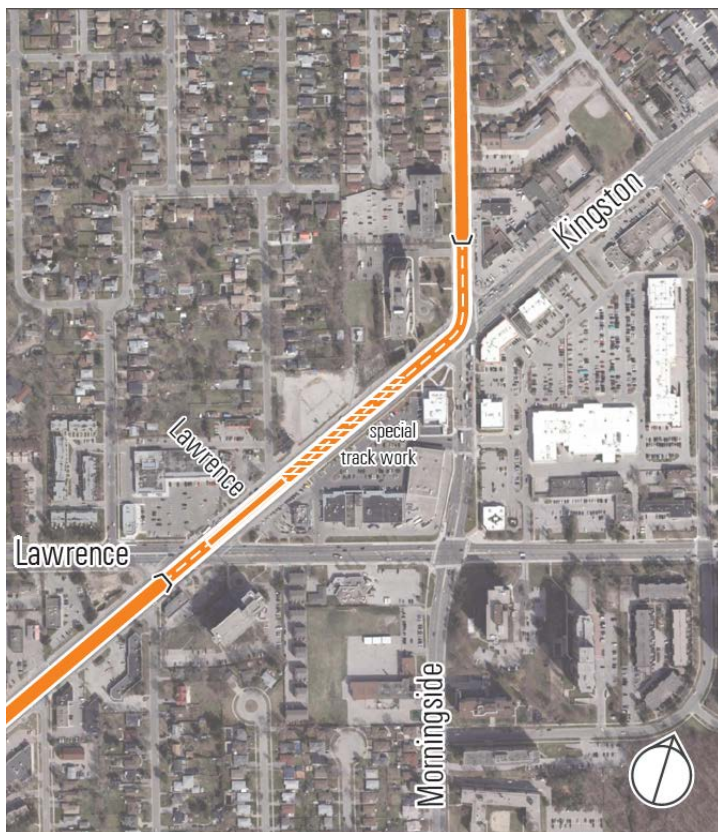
Kingston Road Single Stop below-grade (tunnel)
